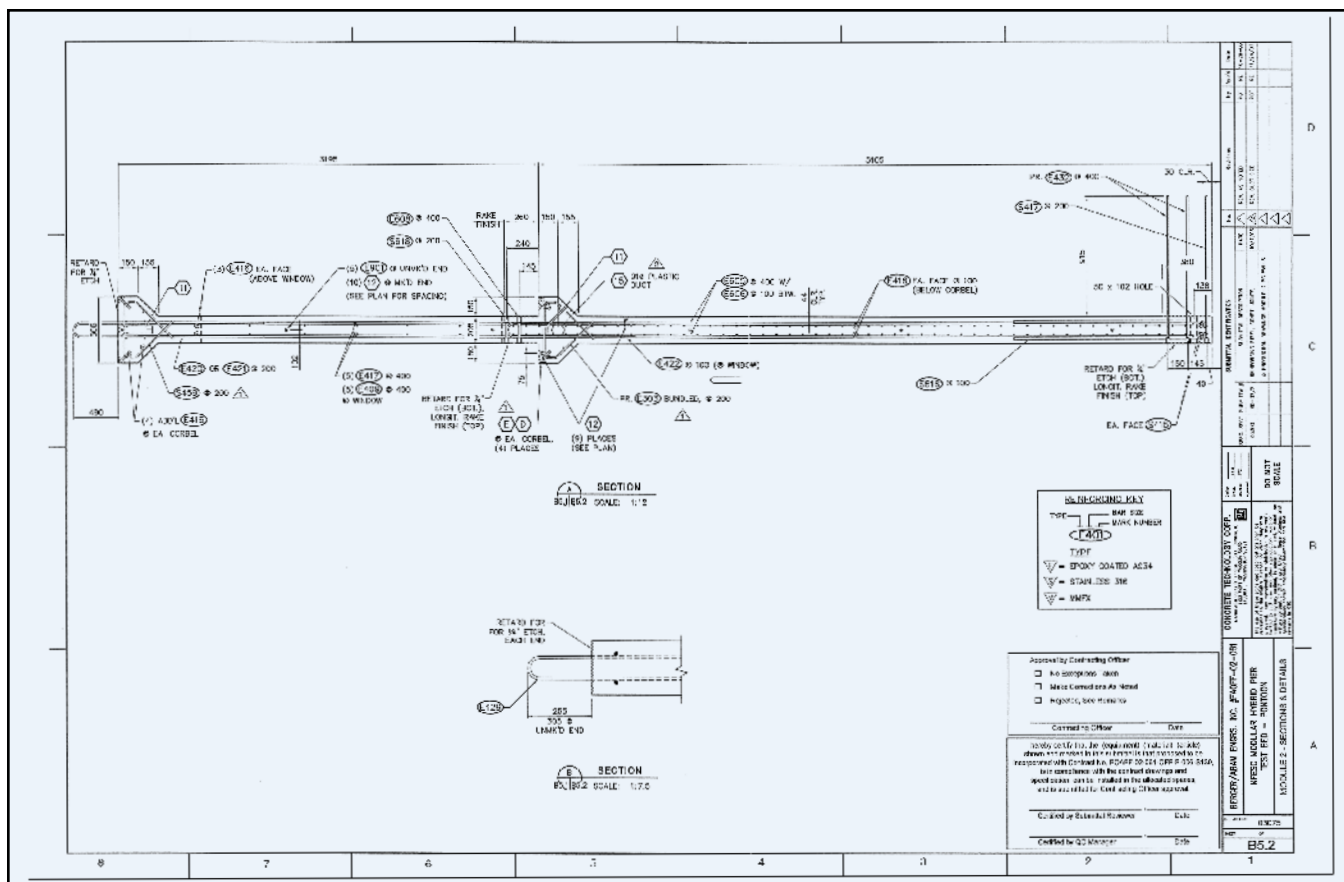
Section and detail drawing of Module 2 precast concrete wall panel.
